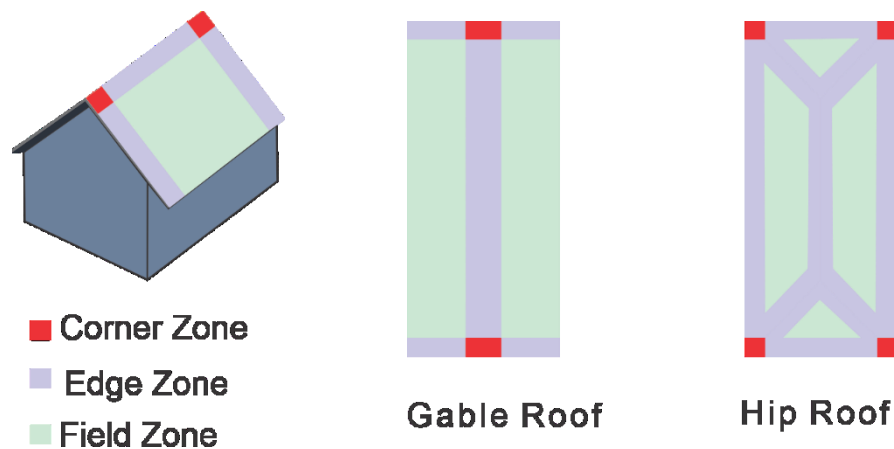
The three roof zones on a gable roof and hip roof [10]
